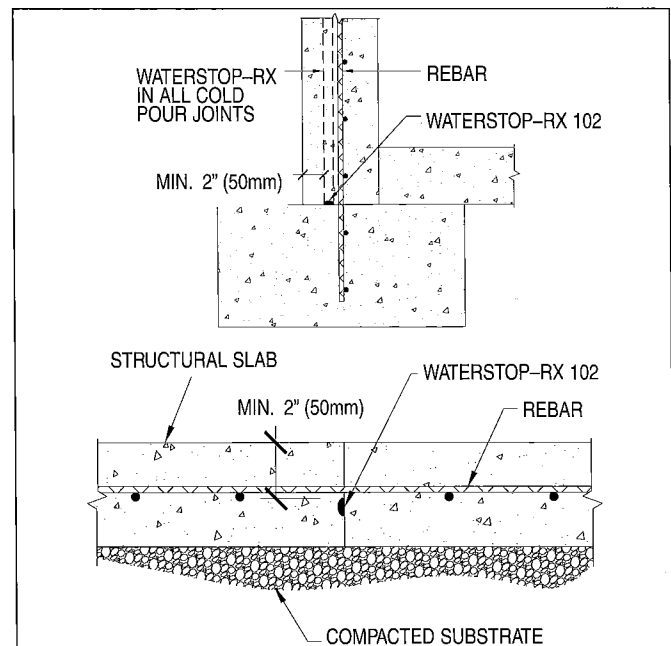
Placement of Waterstop-RX 102 at typical construction joints with required 2" (50mm) concrete coverage.
